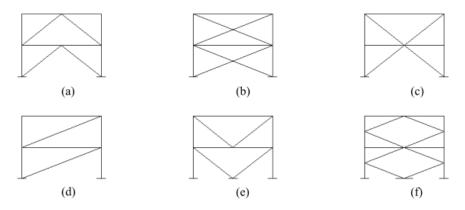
Different types of concentric steel bracing systems (a) opposite V-bracing, (b) X-bracing, (c) 2-story X-bracing, (d) diagonal bracing, (e) V-bracing, and (f) K-bracing (Ozel 2010)
